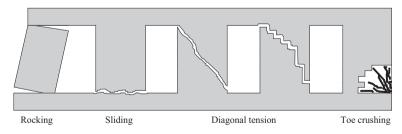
In-plane collapse mechanisms of the piers (adapted from [14]).
